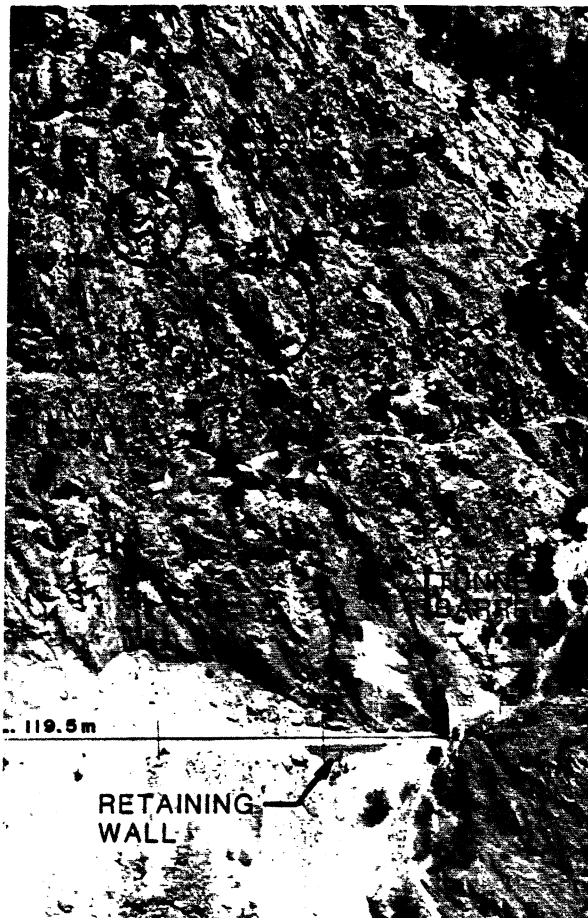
View looking south at Areas No. 1 and No. 2 - Km. 13.8 Yale Sub.
